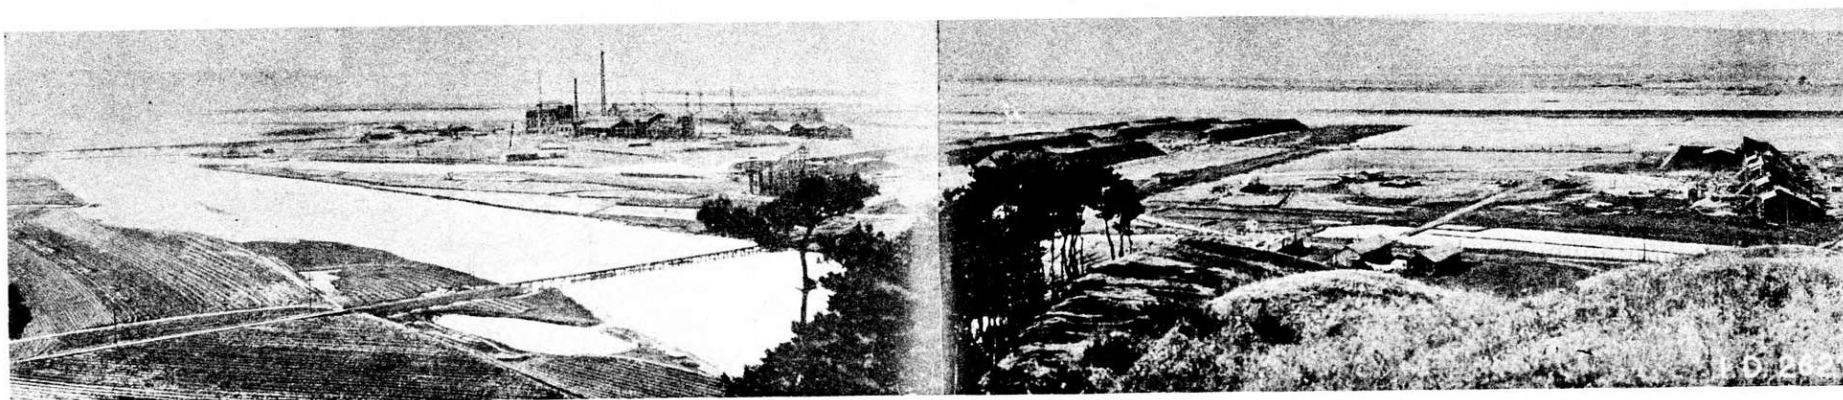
Panoprame of the Chosen Nitrogen Explosives Factory under construction, showing storage revetments in the center of picture. View is looking south-southwest.
